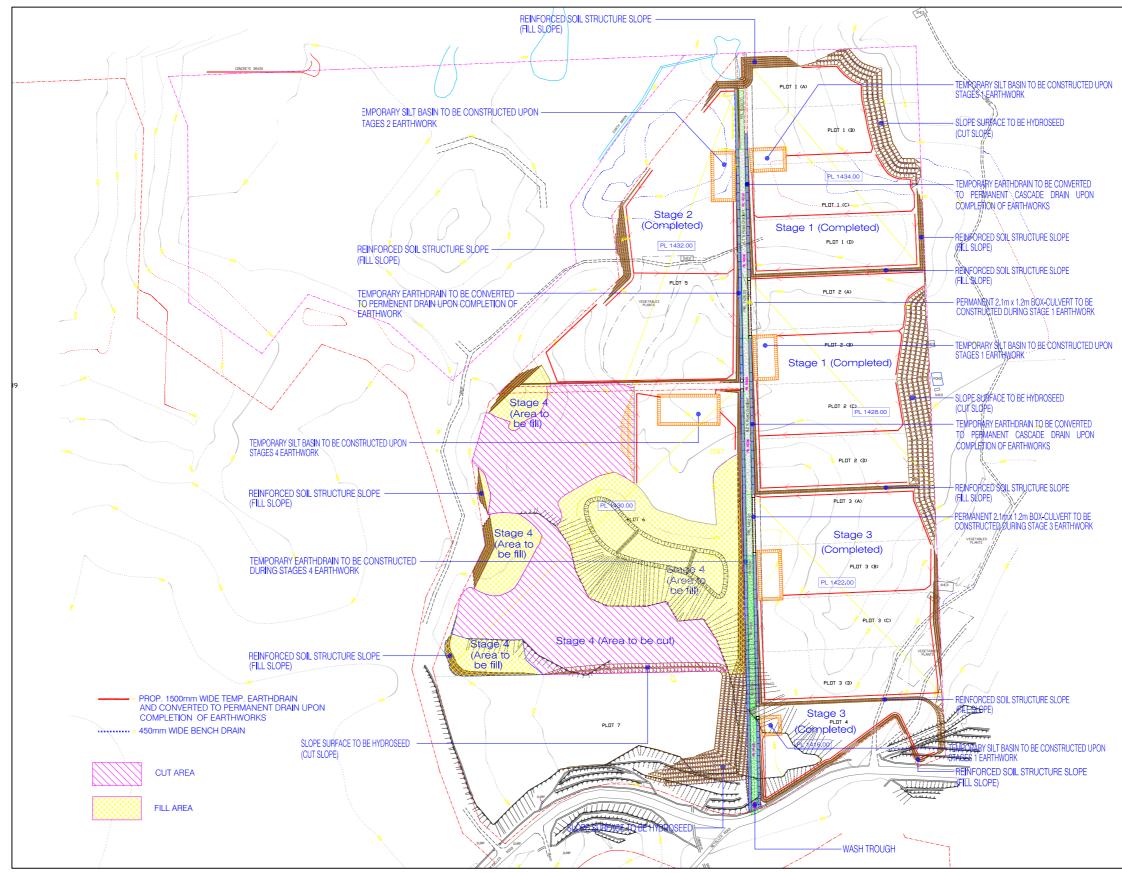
Stage 4 ESC Plan for Proposed Development Area (Deng Seng, 2004).
